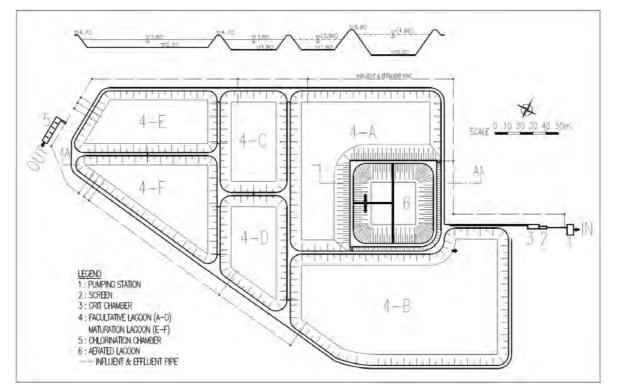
General Plan of Kaolack Sewage Treatment Plant
